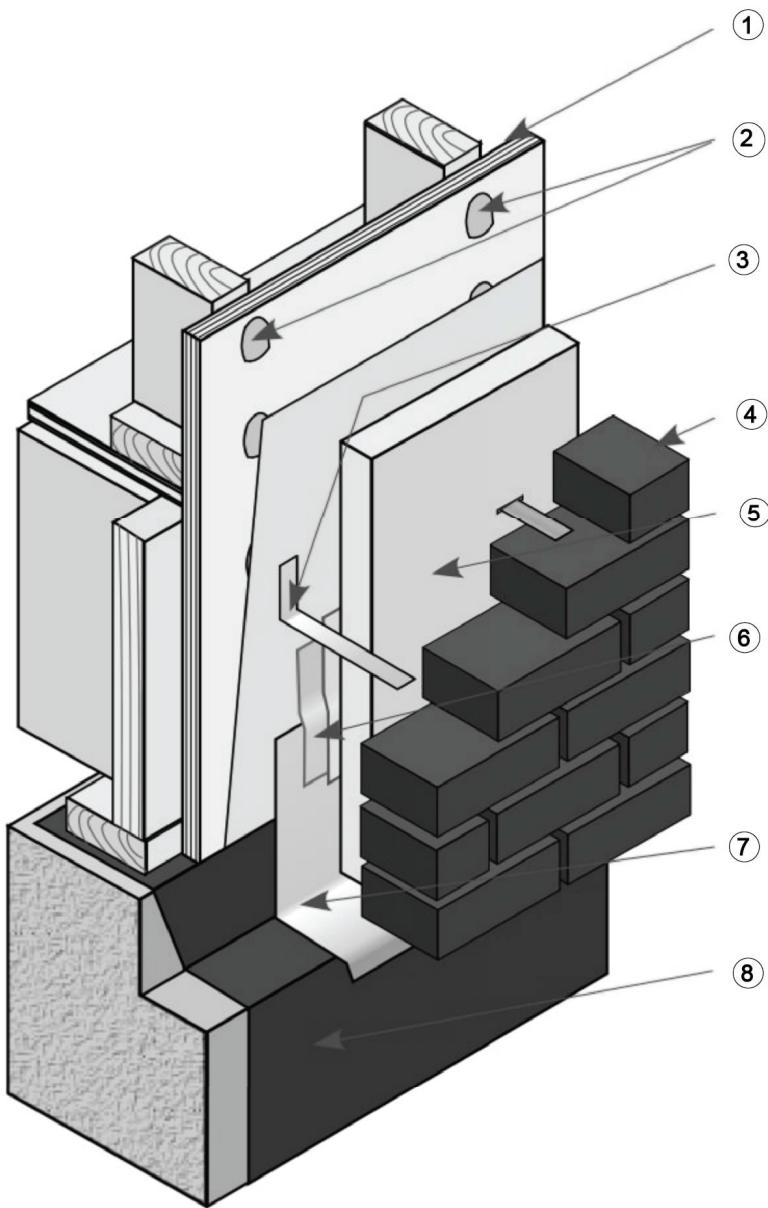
“Sto Guard[®]” continuity at foundation walls and typical insulation with brick veneer cladding:
